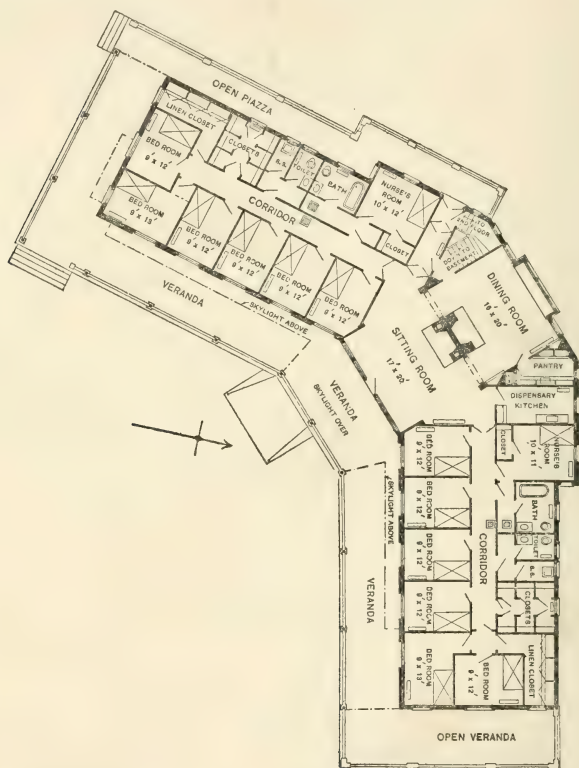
Ground-floor plan of the Louise Childs Memorial Building, Adirondack Cottage Sanatorium, Saranac.
